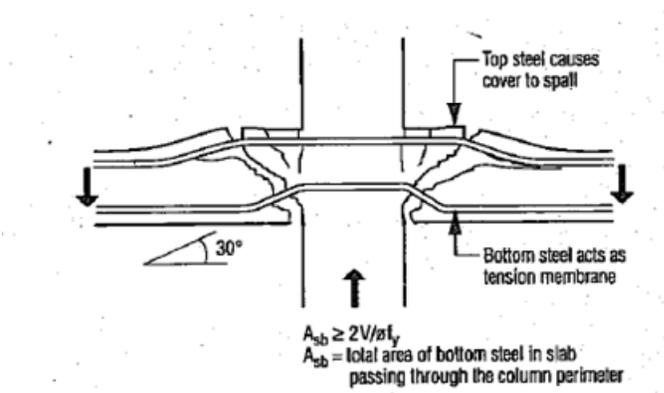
Tensile Membrane (Bottom) Steel at Column-Slab Intersection
